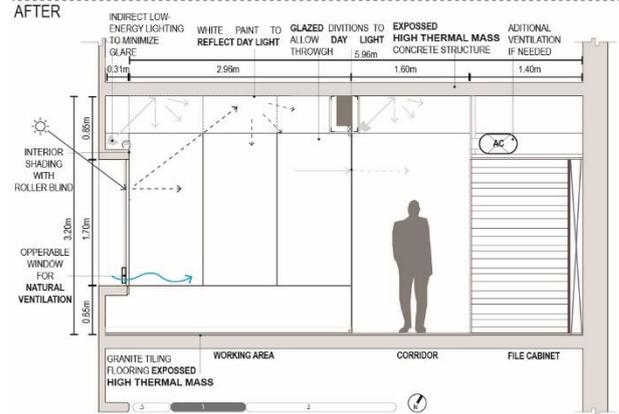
Typical section of studied floor - general construction details and passive strategies and design intentions after refurbishment (existing scenario). The section can be contrasted with the previous scenario show on figure 2.
